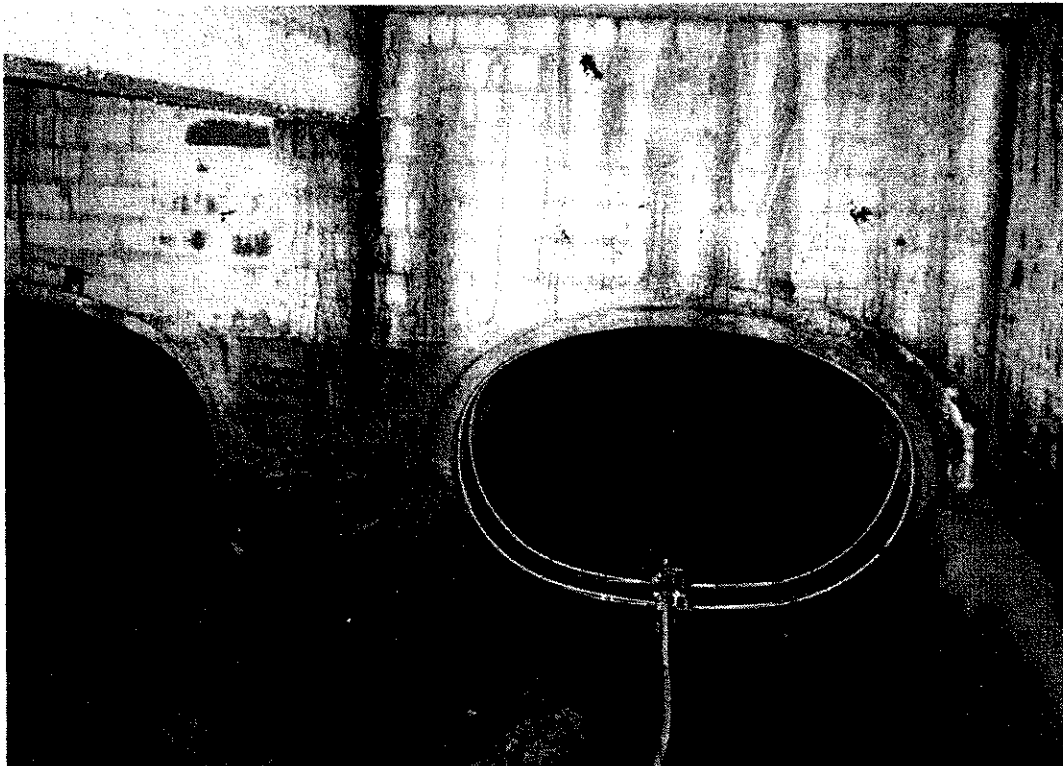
View of Typical Sampler Line Installation in Storm Sewer
